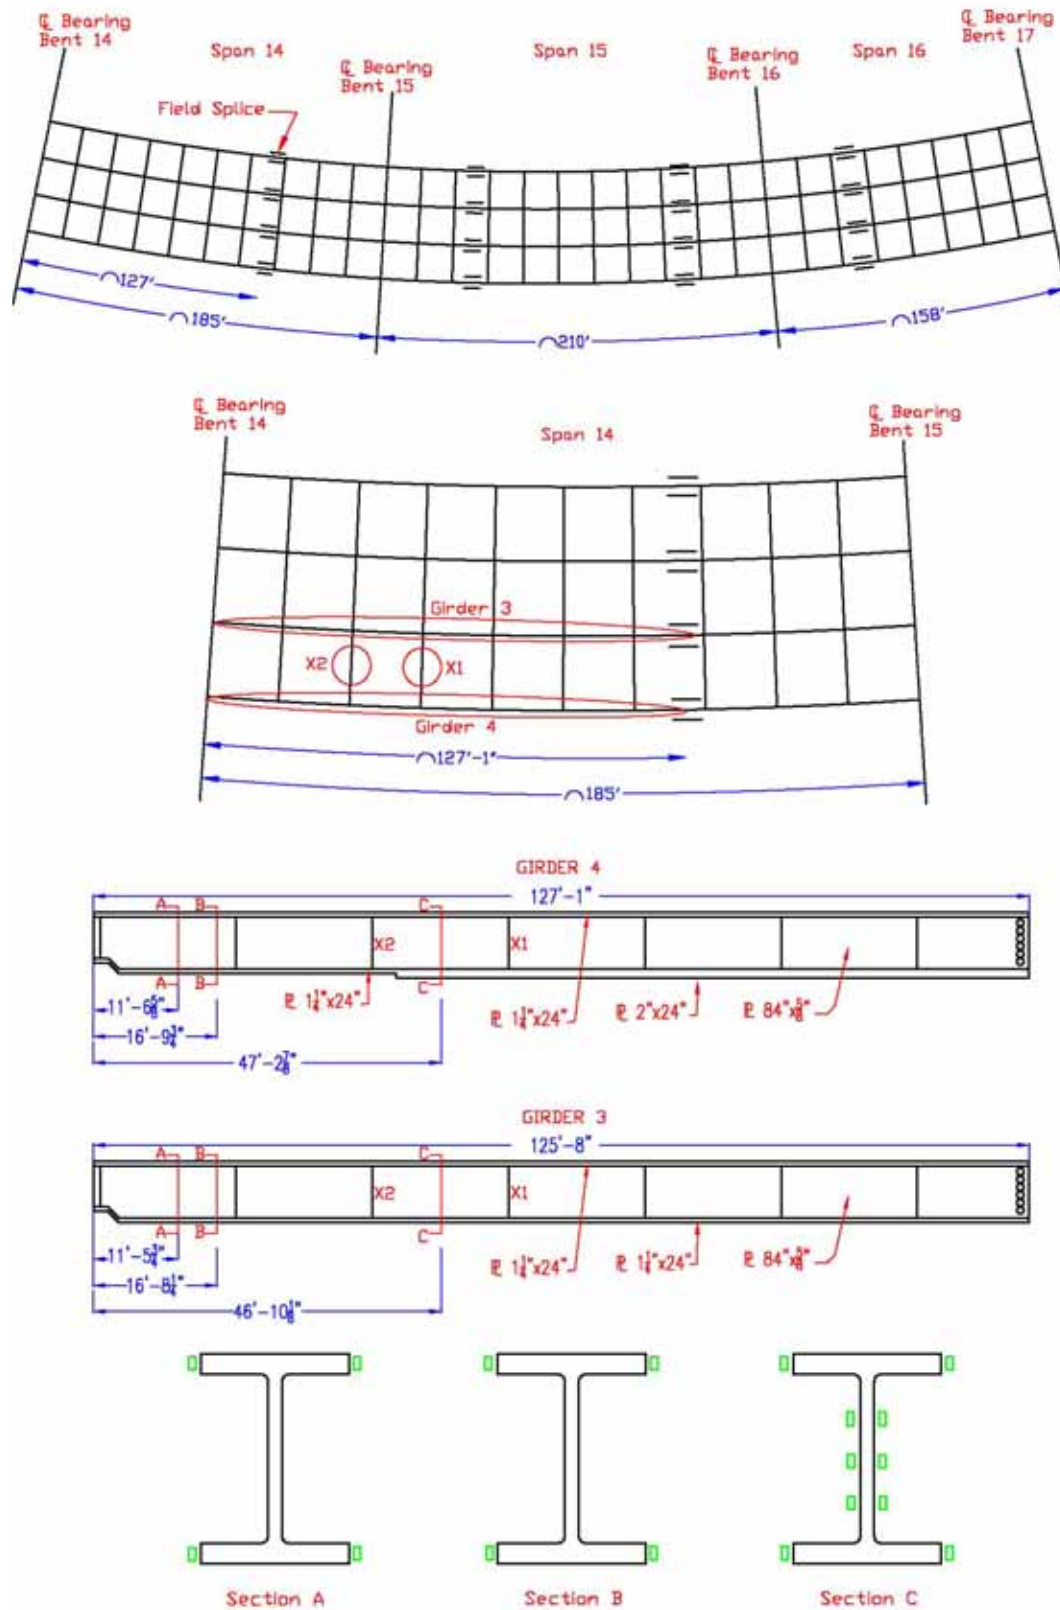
Unit 6 Bridge Framing Plan & Girder Elevations w/ Gage Locations
